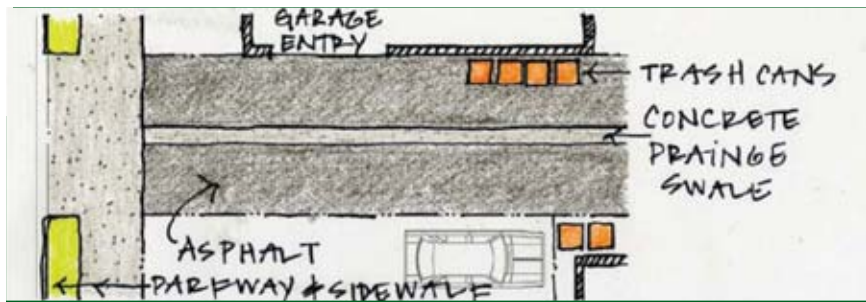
Standard Alley designed with a black top asphalt surface and a concrete drainage swale running down its center.
